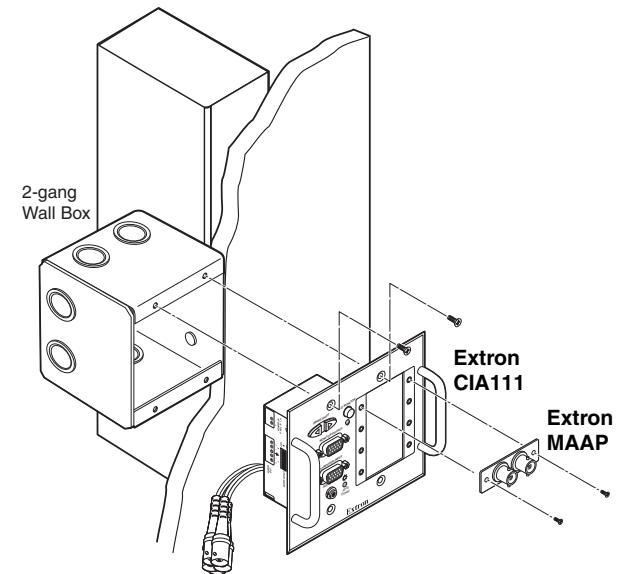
Mounting the optional MAAP device (standard MAAP device shown)
